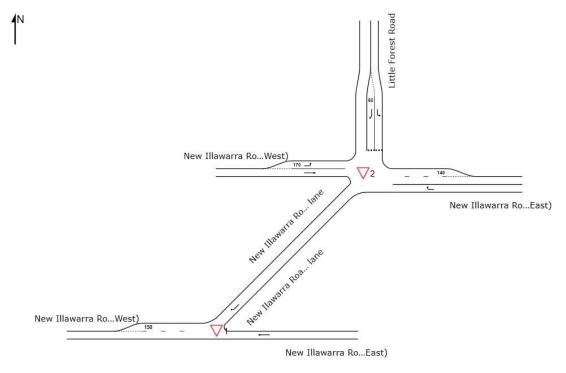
Little Forest and New Illawarra Road SIDRA intersection layout
